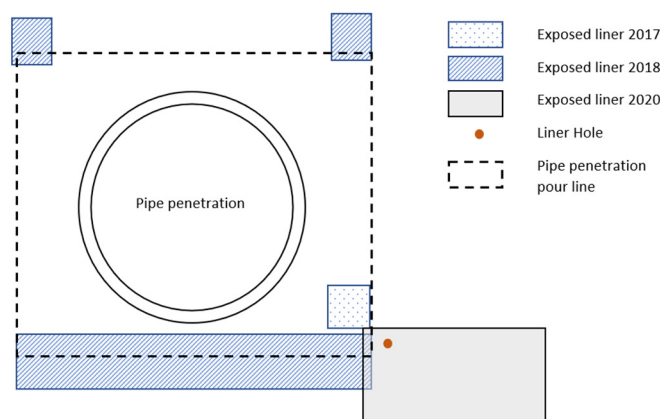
Pipe penetration and investigation openings performed between 2017 and 2020 to inspect the liner (not to scale)
